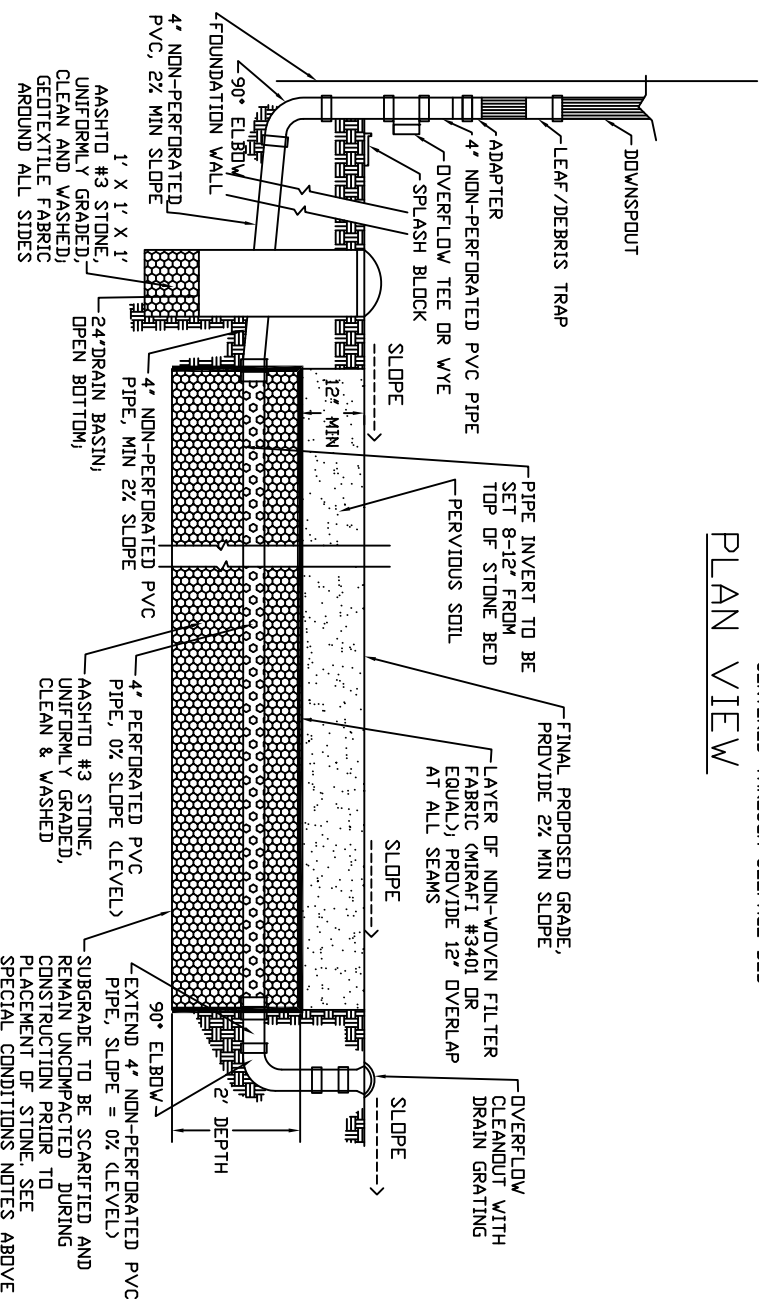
Example of Simplified Stormwater Management Site Plan for Joe Homeowner
